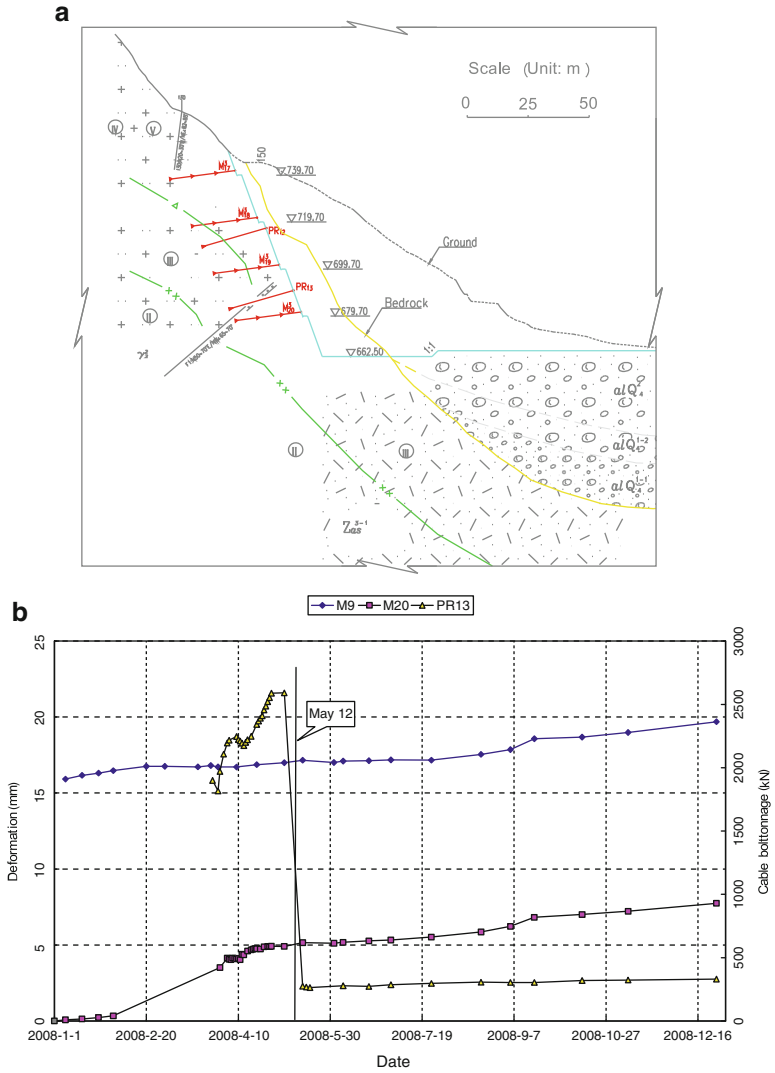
Failure of cable bolts at the Pubugou hydropower project. (a) Layout of instruments. (b) Comparison between deformation and cable tonnage.
